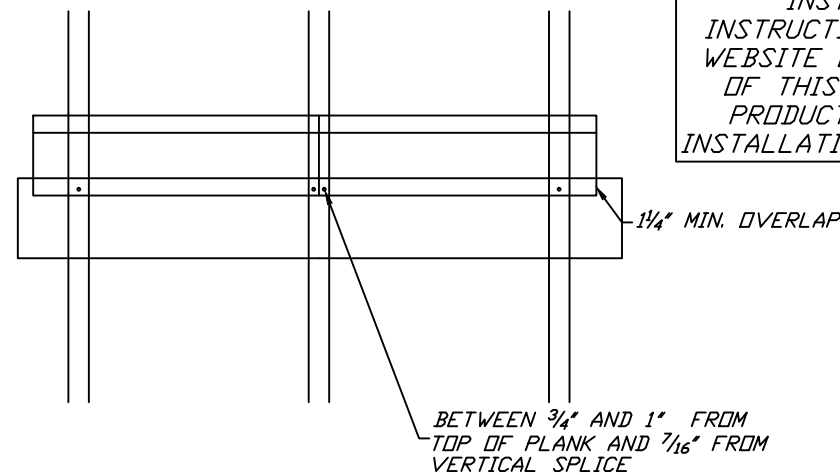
DETAIL FOR HARDIEPLANK 8 1/4" SIDING
